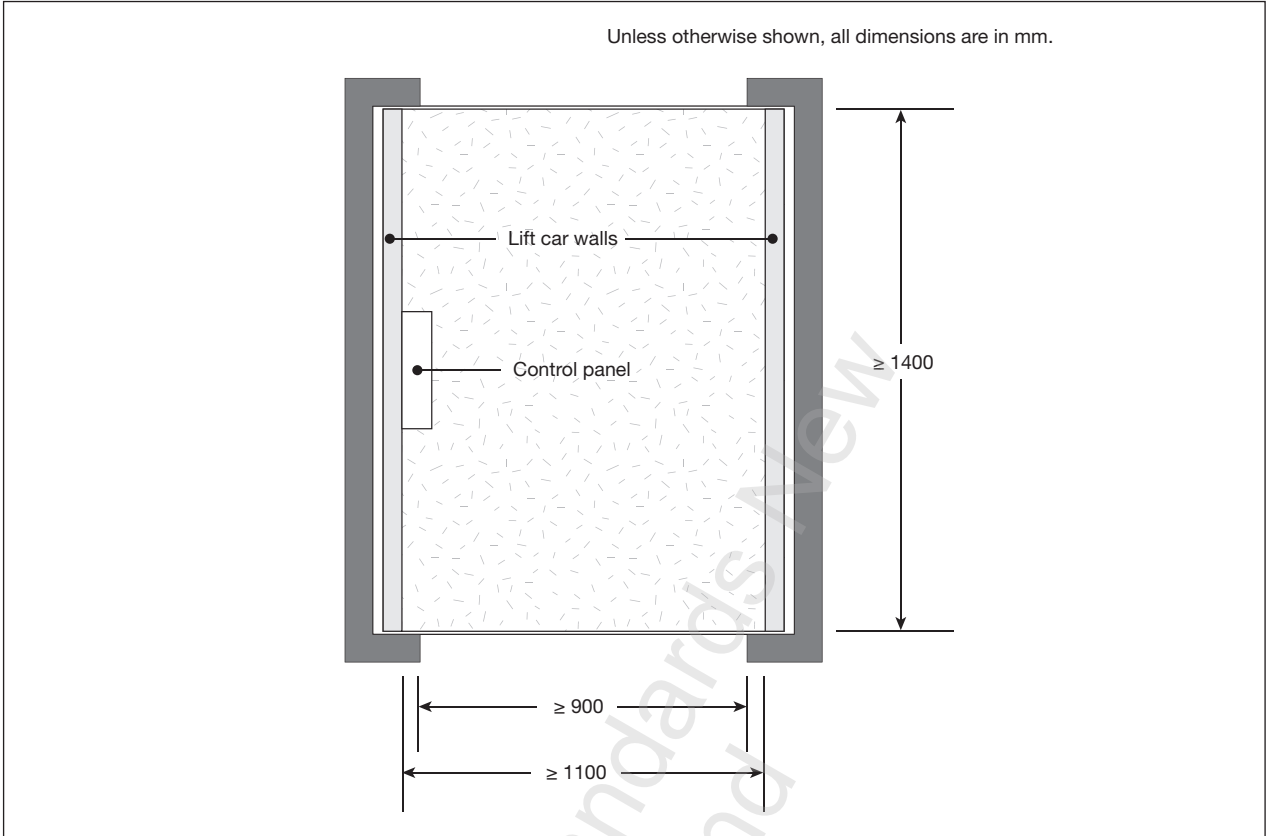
Layout for minimum size of two-level public lift with entrances on opposite sides
